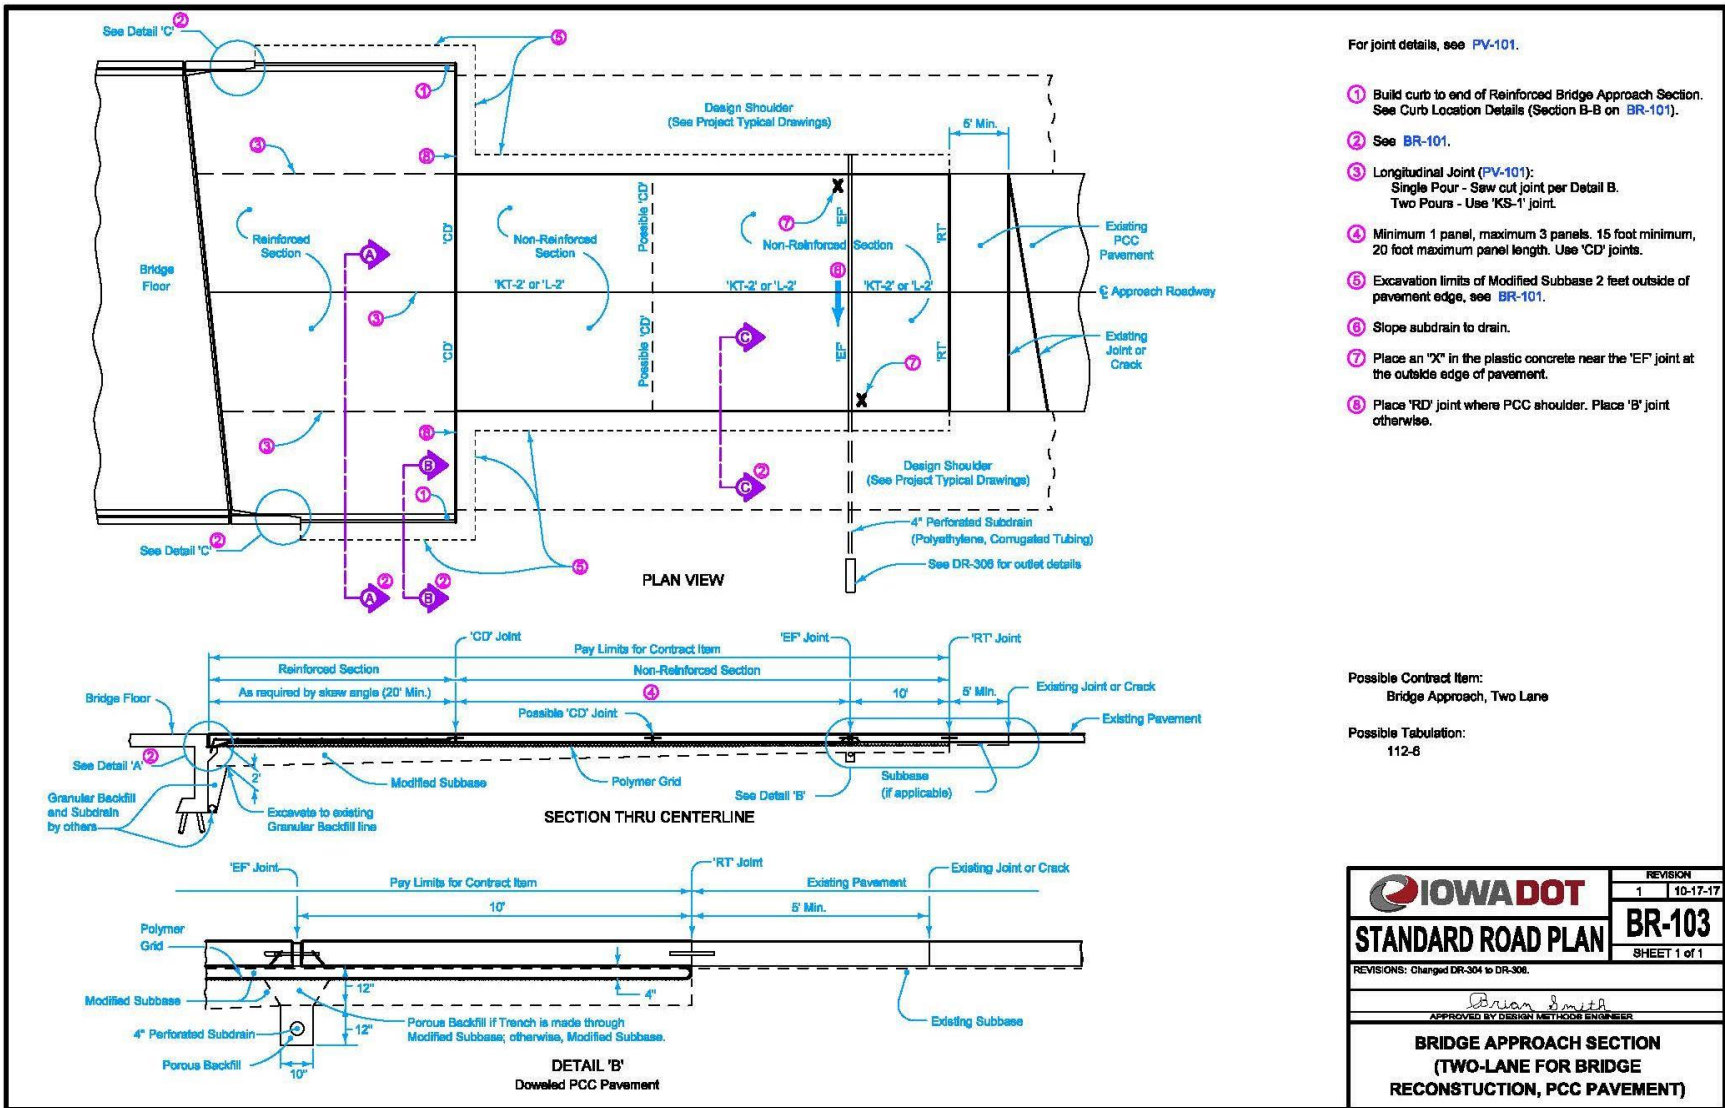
Iowa DOT Standard Road Plan BR-103 – Bridge Approach Section (Two-Lane for Bridge Reconstruction, PCC Pavement) [68]
